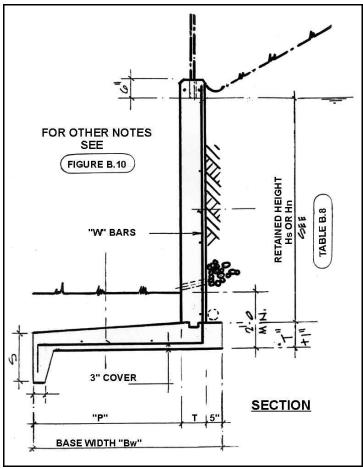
Concrete cantilever retaining wall, toe out, H = 4' to 14 feet (Bernier, 1995).
